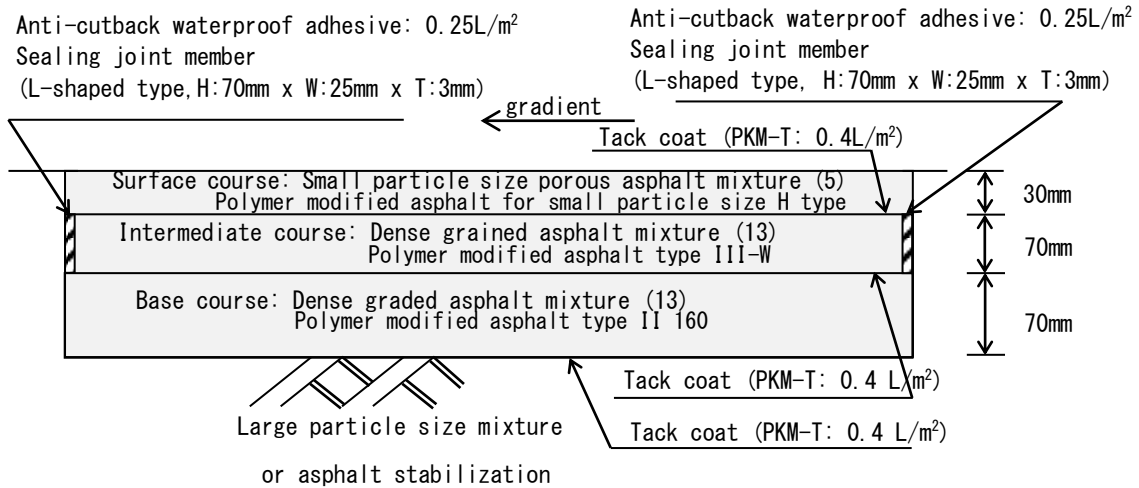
Pavement structure of the Metropolitan Expressway’s earthwork section
